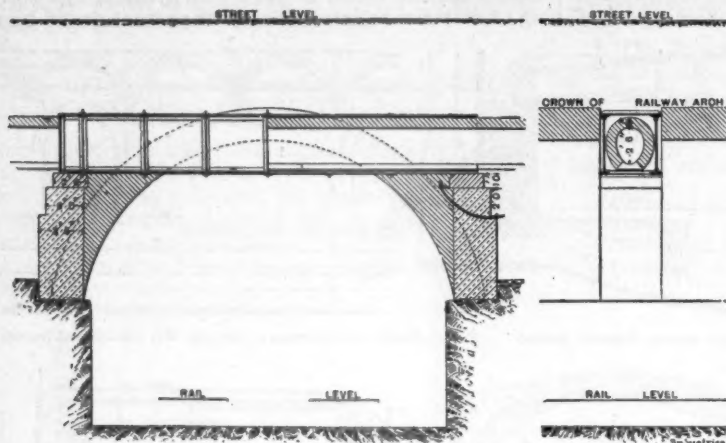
AND 10.—SECTIONAL VIEWS OF TUNNEL AT DUMBARTON ROAD, SHOWING CROSSING OF SEWER.
